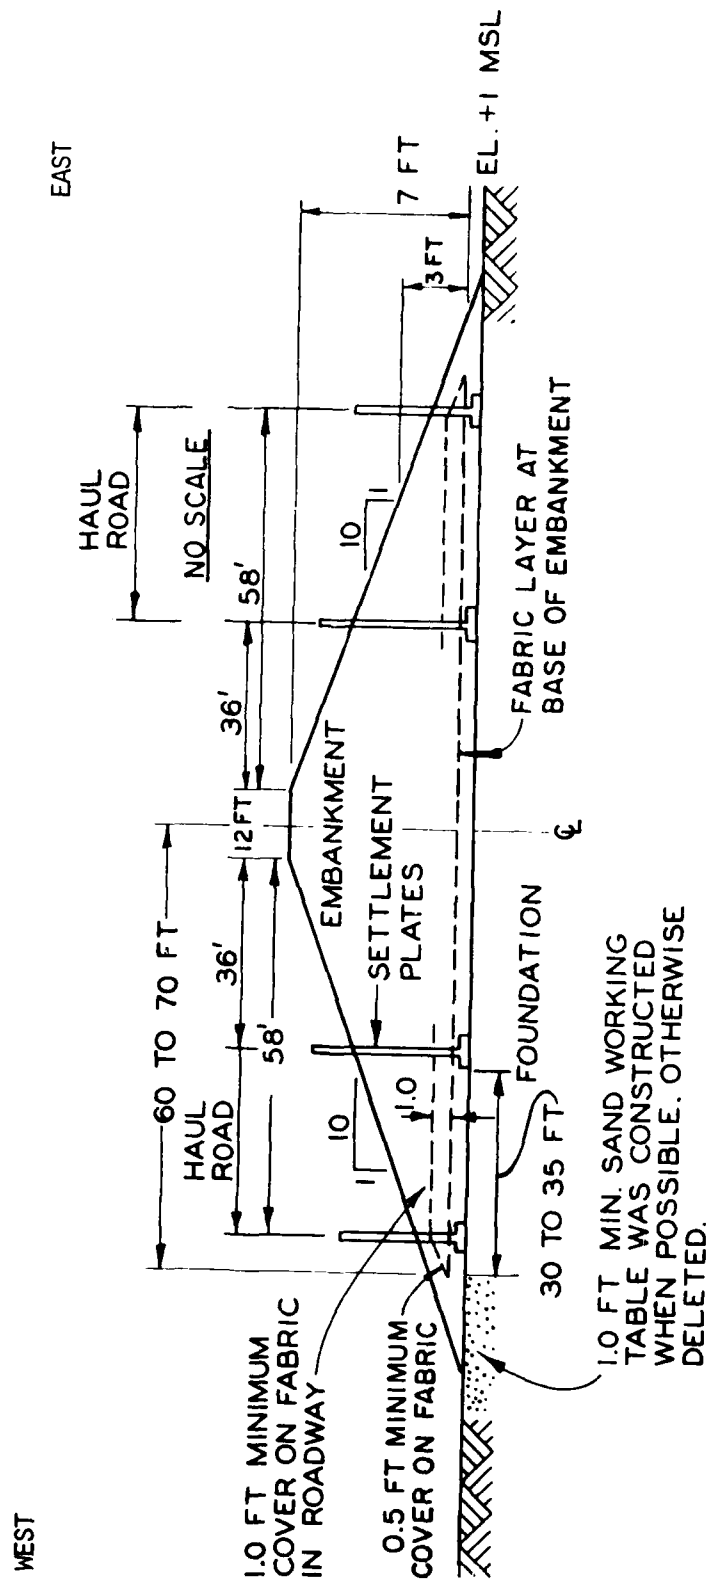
Construction Details of Actual Fabric-Reinforced Embankment Section
